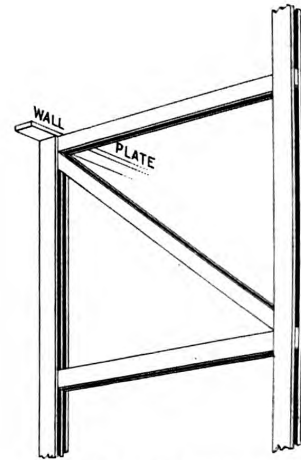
Detail of Framing Just Below the Wall Plates.
